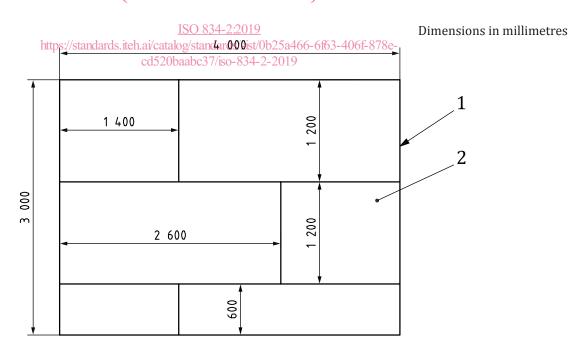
Details of horizontal supporting construction — Layout of support channels
